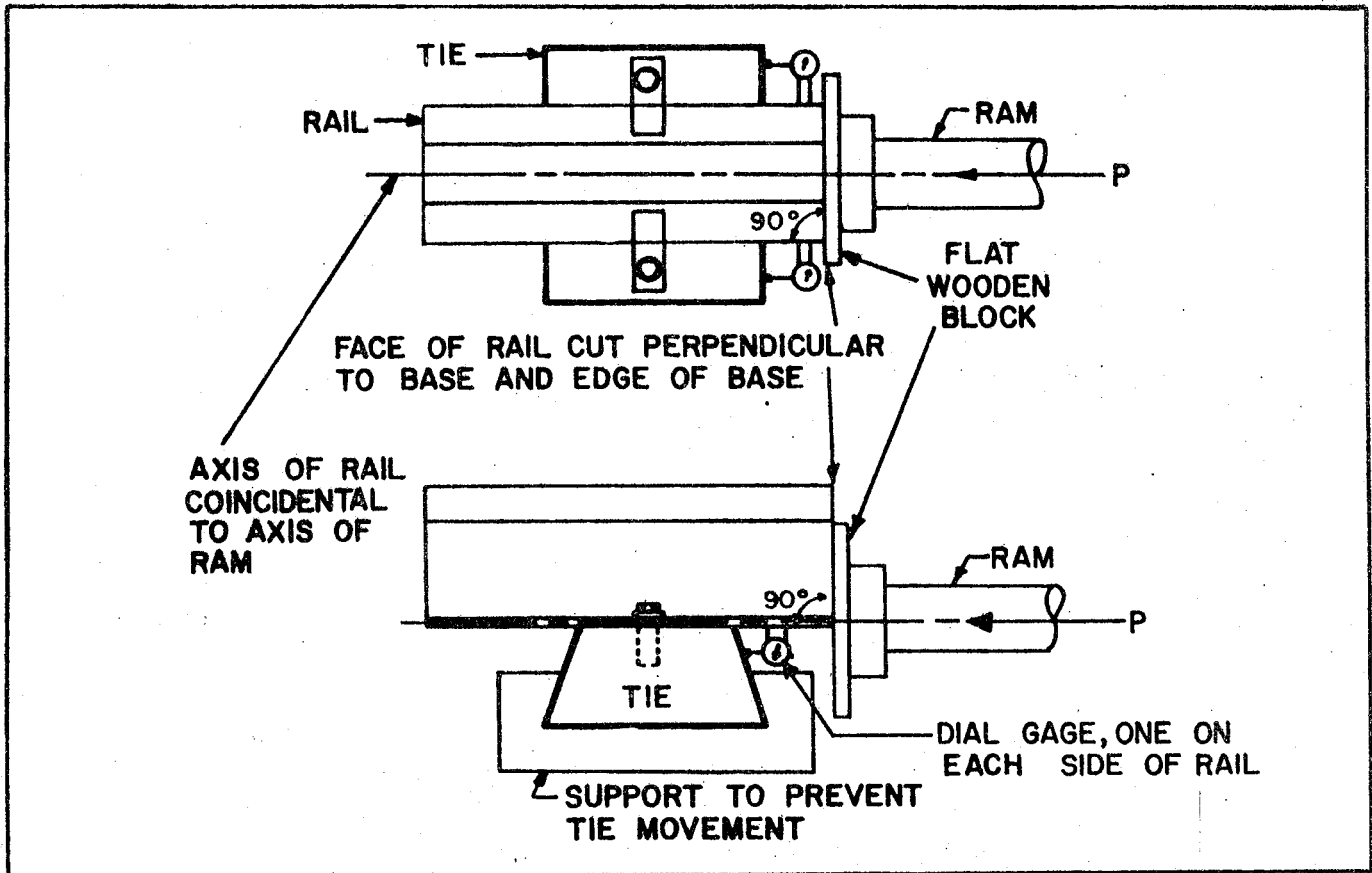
FASTENING LONGITUDINAL RESTRAINT TEST
